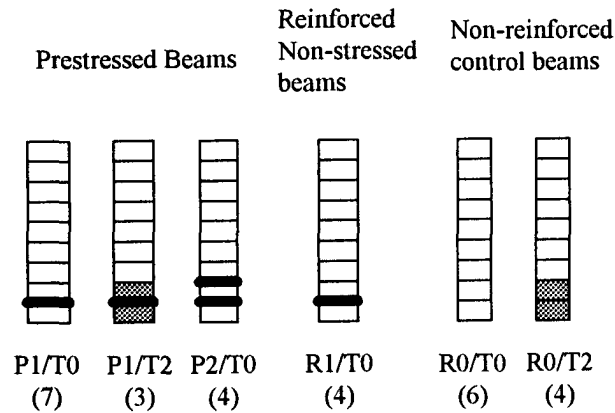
Test Matrix of Reinforced, Prestressed, and Control Beams
